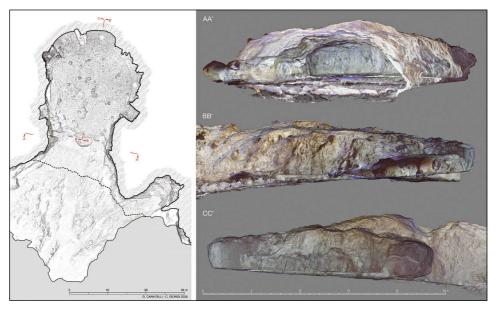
Capri, Grotta dell'Arsenale. Plan and sections from the 3D point cloud model.
